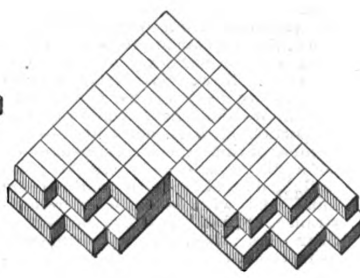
Internal Angle of Wall Three Bricks Thick.
